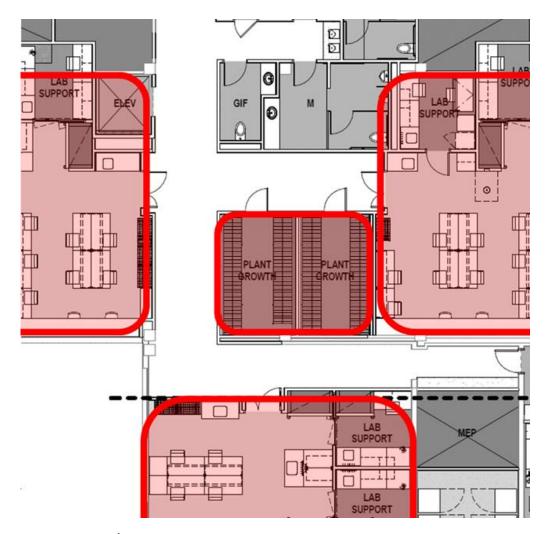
3rd Floor elevator lobby illustrating typical separate access for 3 laboratory areas and 2 plant growth rooms.
